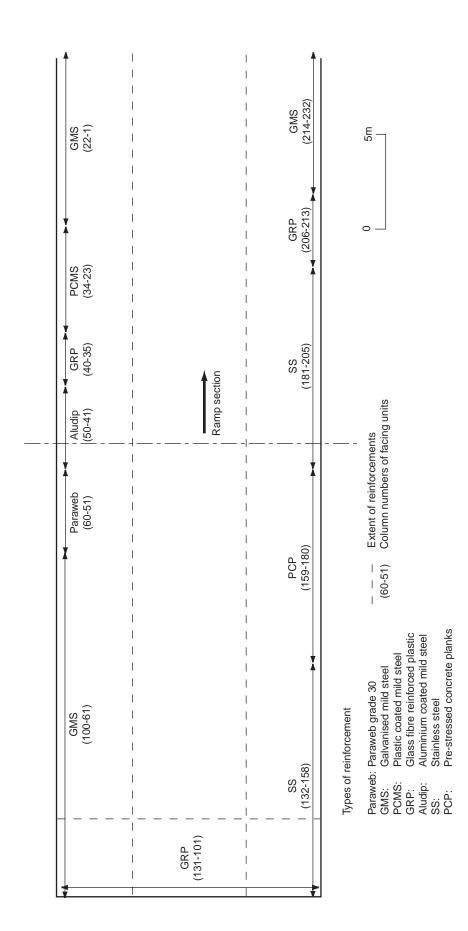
Plan view of the experimental reinforced soil structure at the Laboratory
